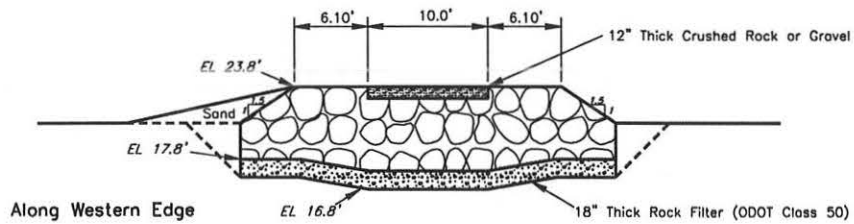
DETAIL A - TYPICAL PROFILE OF ACCESS RAMP
